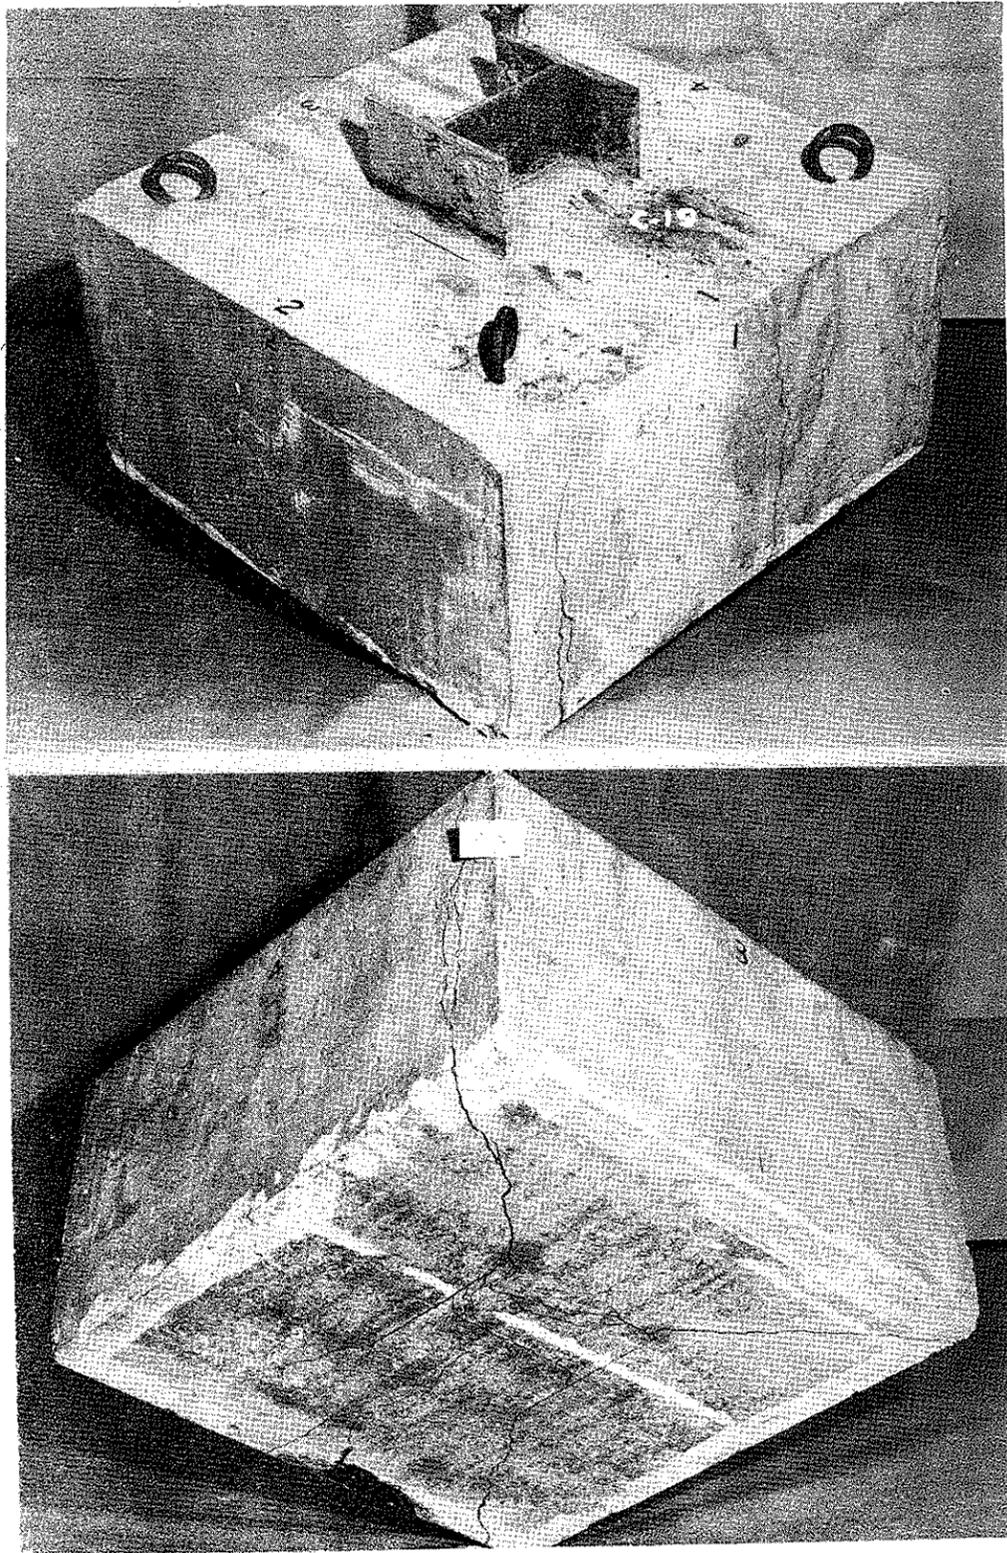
APPEARANCE OF SPECIMEN C-19 AFTER TESTING.
